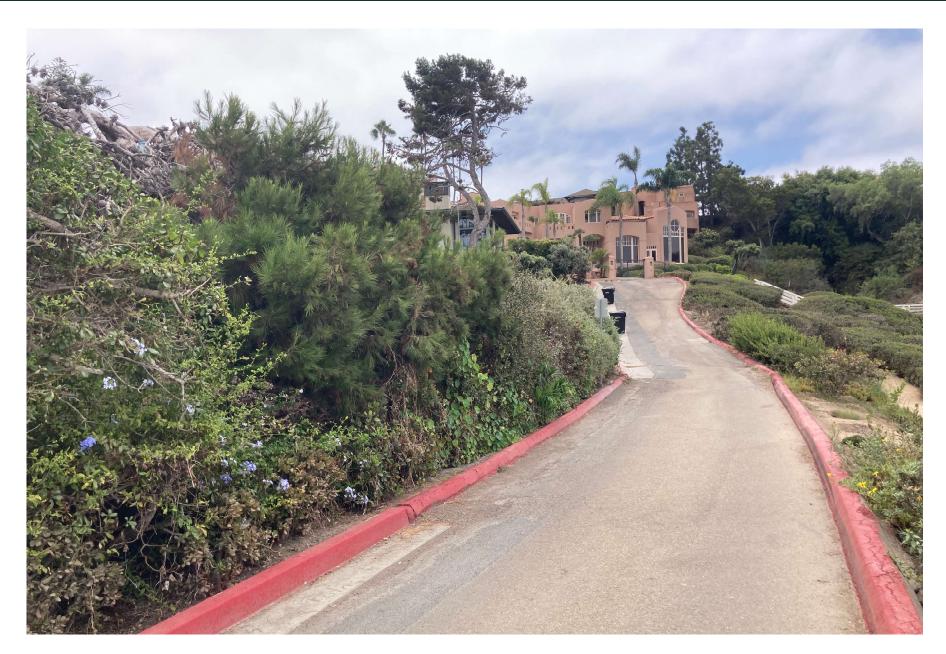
SOUTHWEST VIEW FROM STREET
